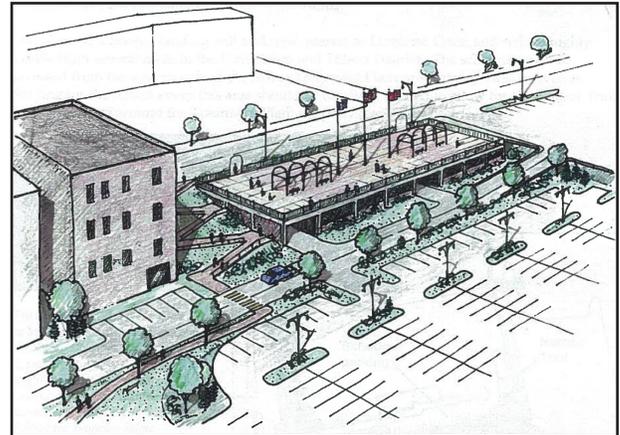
Proposed improvements at the Ferry Terminal parking lot, showing a trail connection to Main Street. (Source: 2005 Rockland Downtown Revitalization Update)
